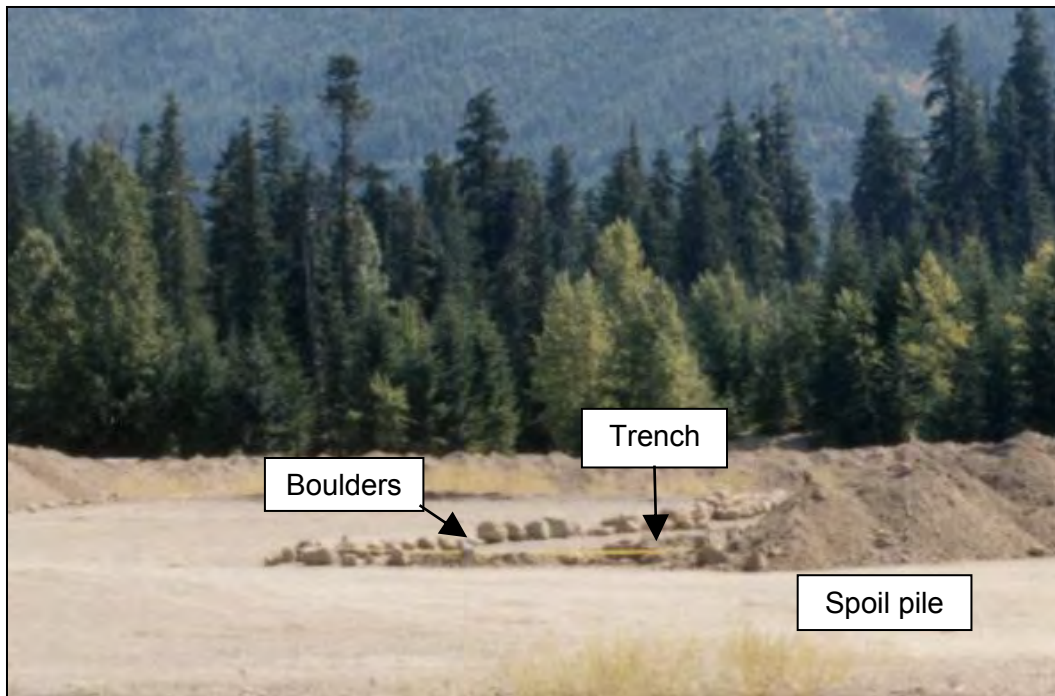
Exploratory trench excavated at a potential borrow area. During the excavation, the boulder-size material was set aside to better characterize the deposit.
